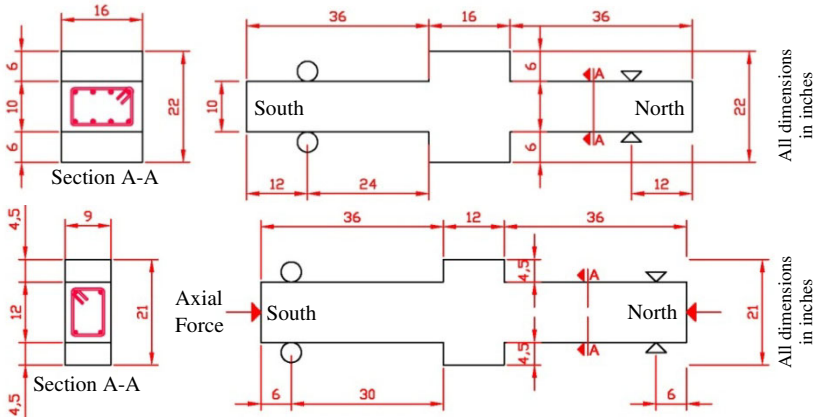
Geometry of test specimens, beams (top) and columns (bottom), 1 inch = 25.4 mm
